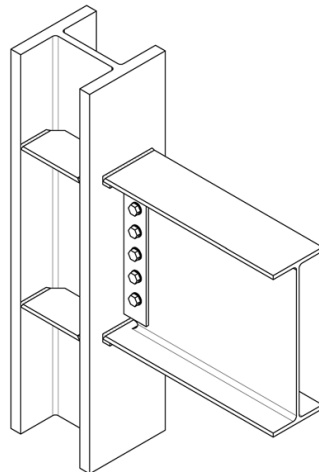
Schematic of a welded steel moment resisting connection that was common in steel frame construction (1960's to 1995). The web of the beam is simply connected using bolts. In contrast the flange of the beam is welded to the flange of the beam.
